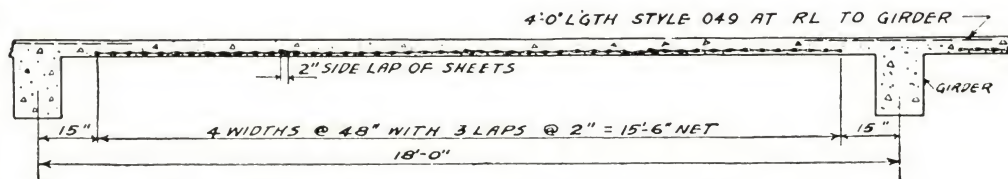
, Detailing Widths of Wire Fabric and Showing Extra Strip of Fabric Over the Girder
